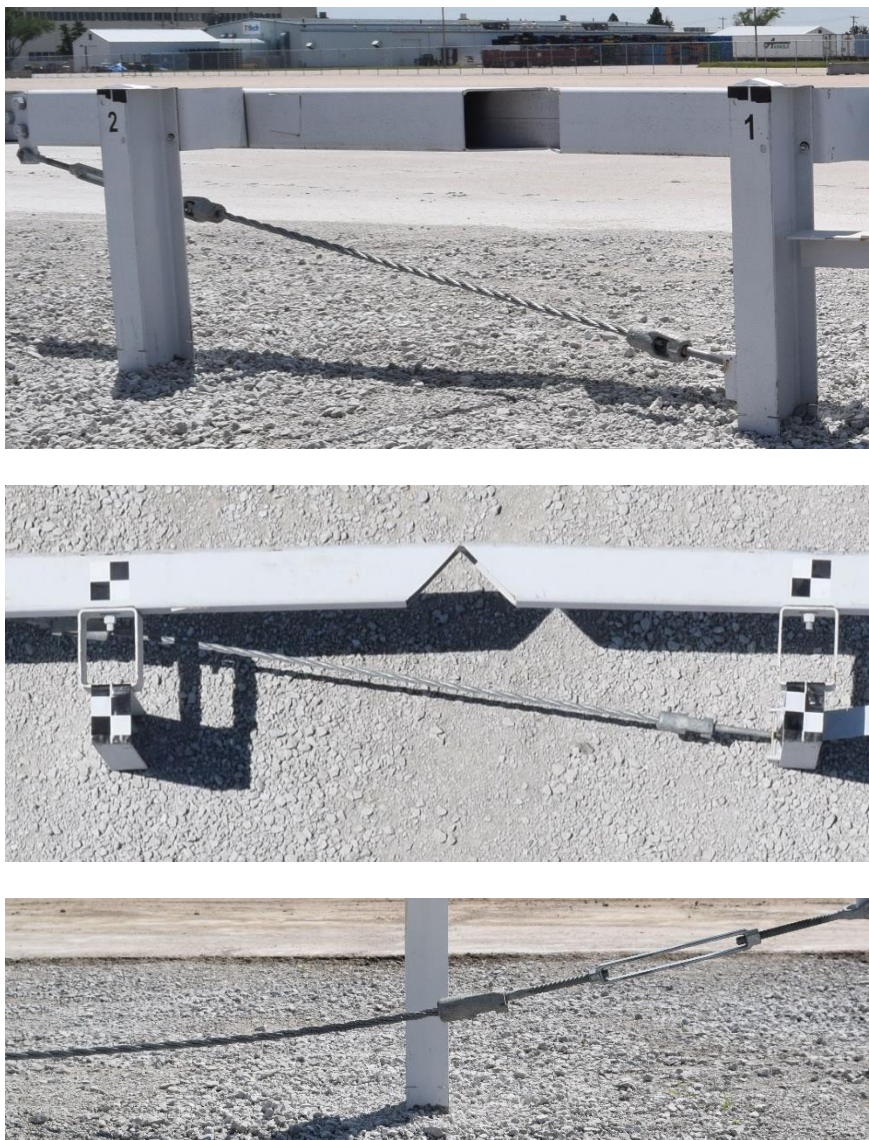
Test Installation, Upstream Anchor Details, Test No. NYT-1
